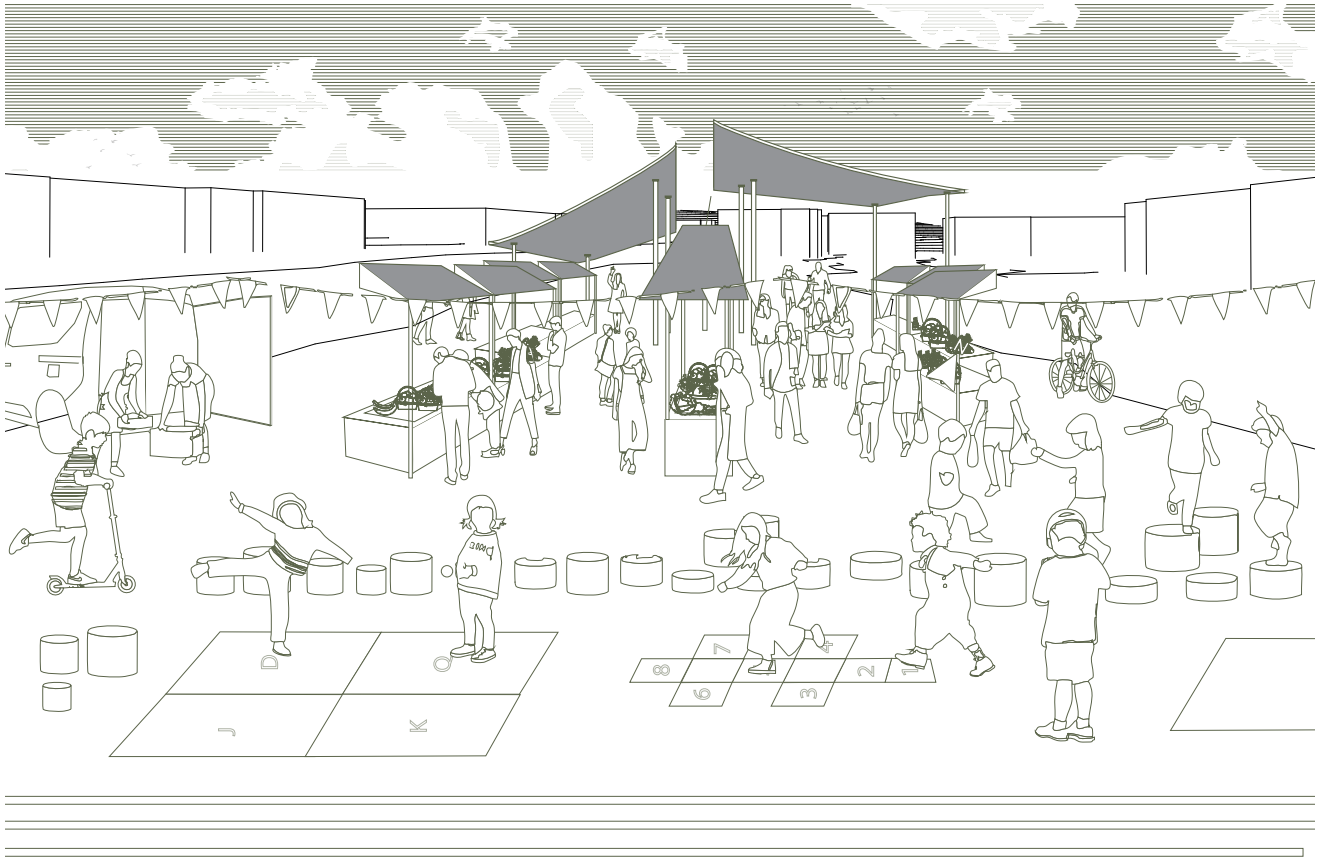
Temporal Market Space Site Plan (2025), Authors Artwork
